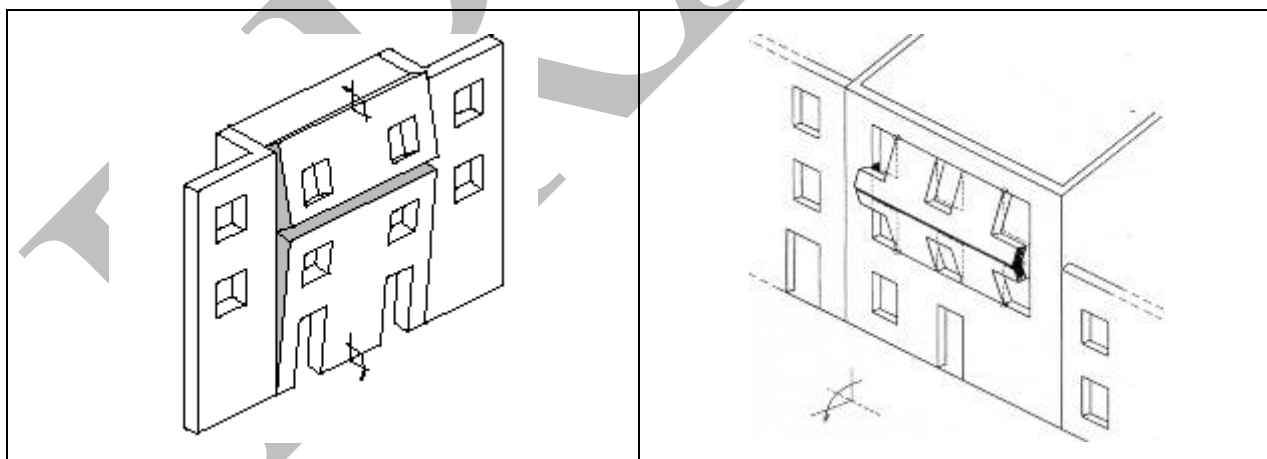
Class B – Damage to out-of-plane loaded walls: examples of sub-class B-b in case of top edge fixed.
